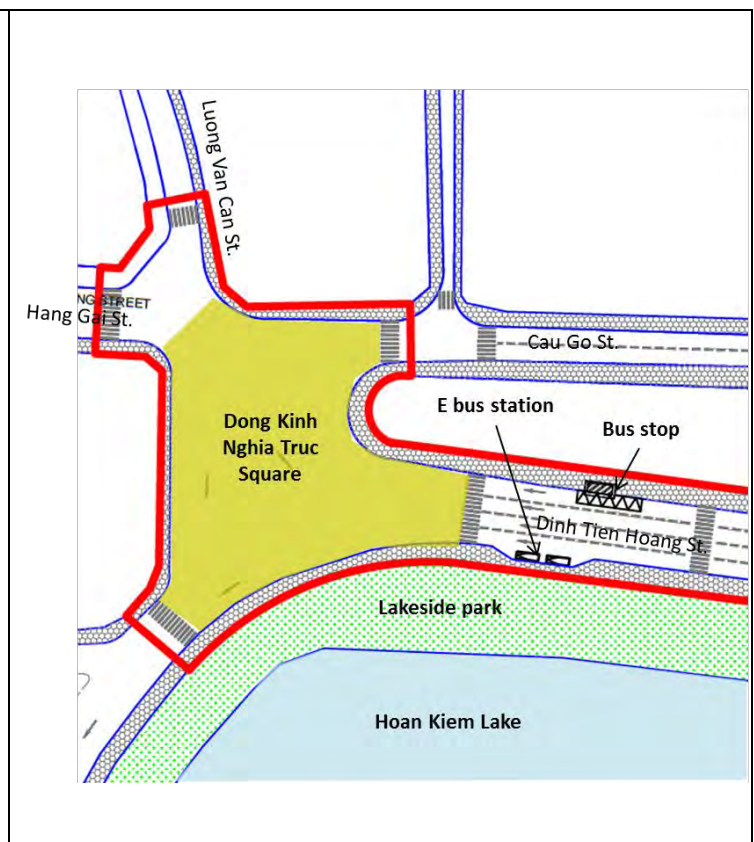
Layout Plan of E Bus Station and Improvement of Dong Kinh Nghia Truc Square
